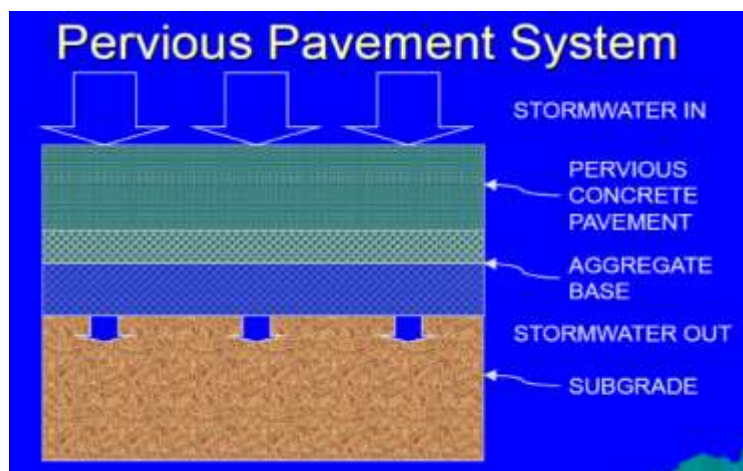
Typical Cross Section Showing Layers Of Pervious Pavement System
